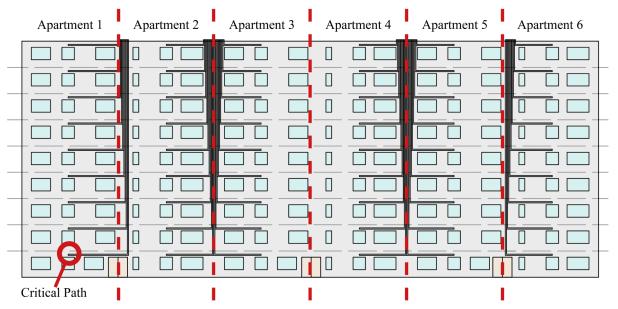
Plan detail of a typical 120mm x 80mm facade duct layout
